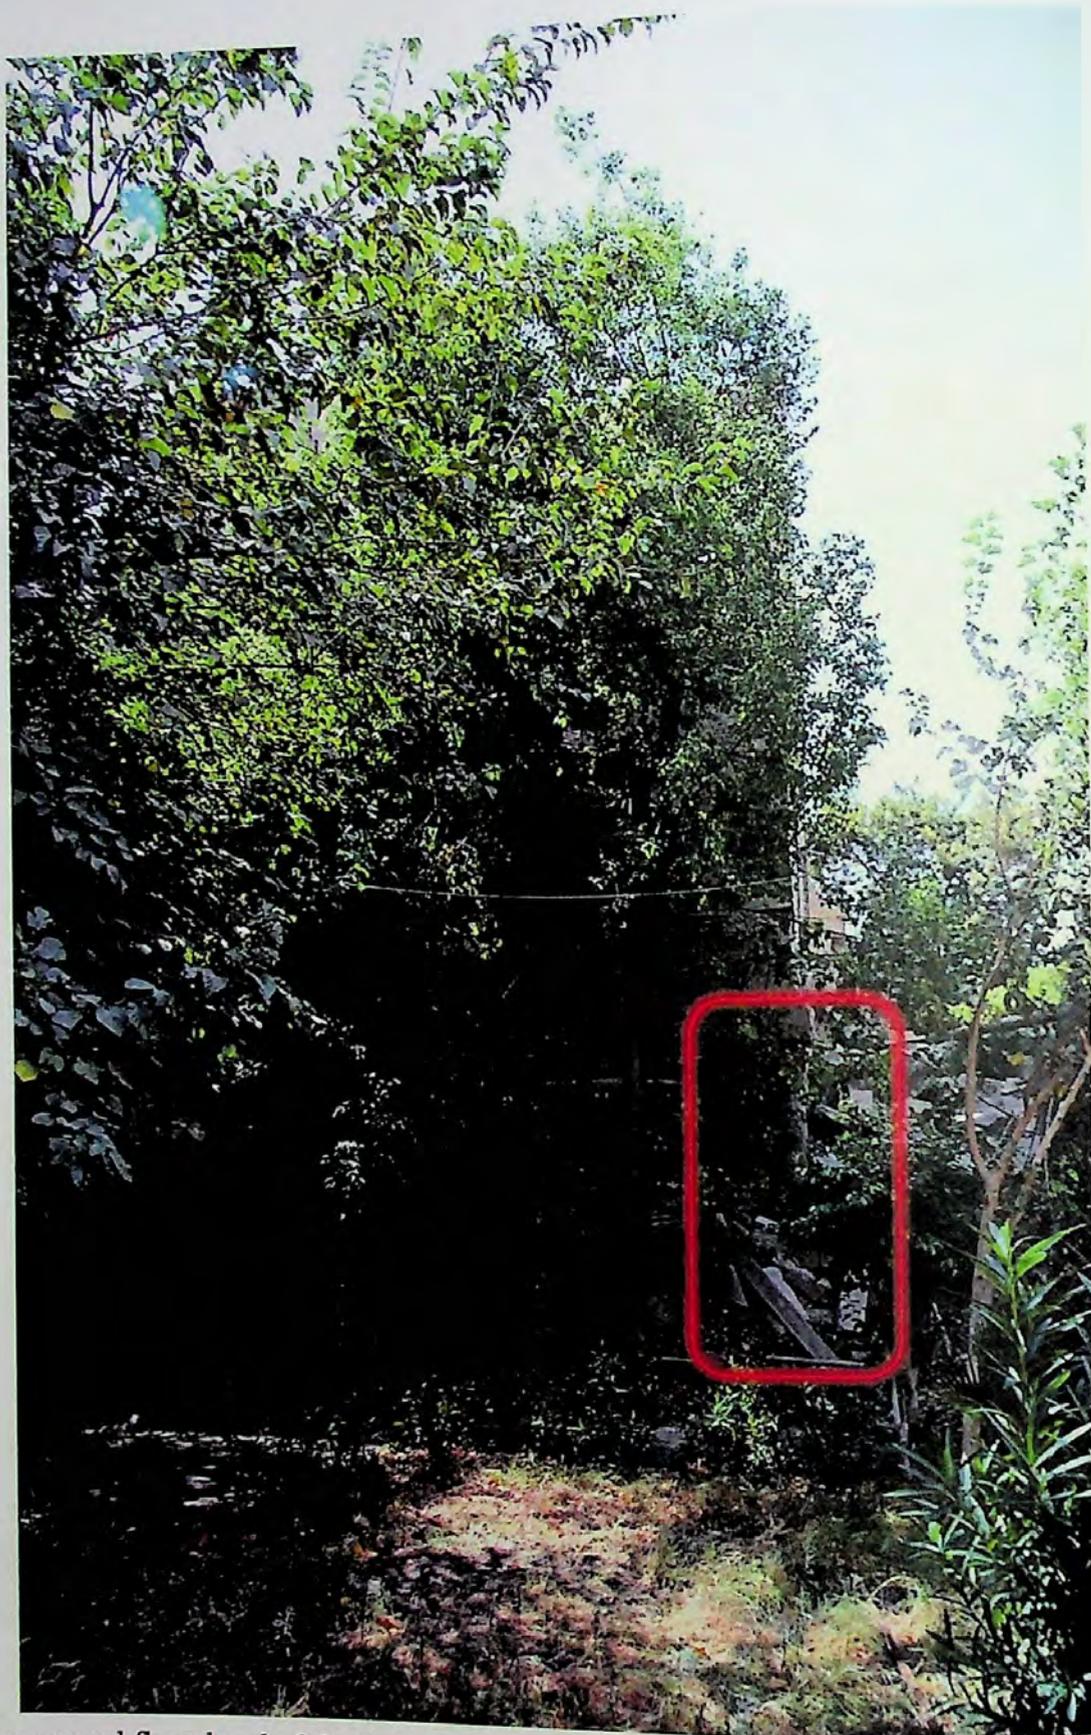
The ground floor level of the Jaqmaq-Inal hall concealed behind ruins with the corner column for support.
